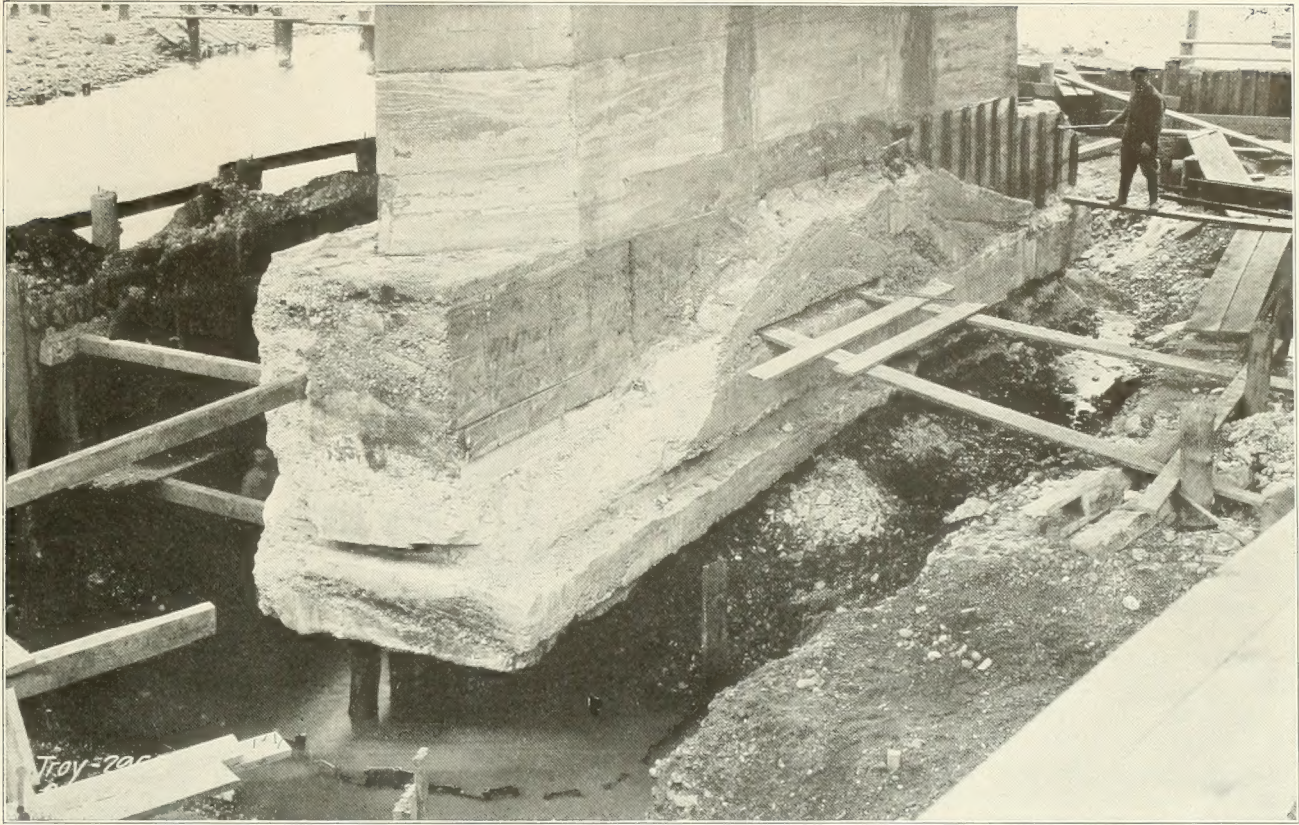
A PIER OF THE ADAMS STREET BRIDGE READY FOR UNDERPINNING, FEBRUARY 6, 1922.
